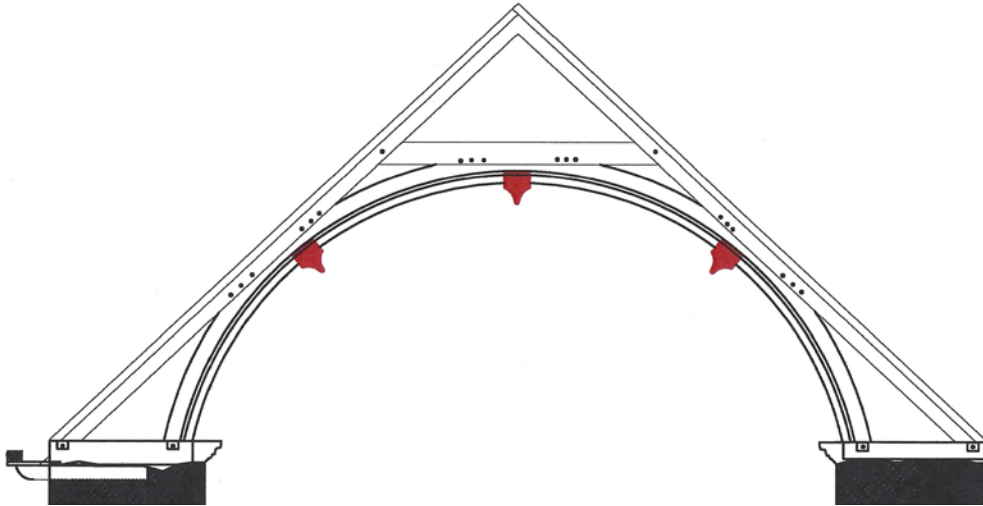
A south aisle roof truss, typical of wagon roofs (after Chadburn Conservation Architect 2015)
